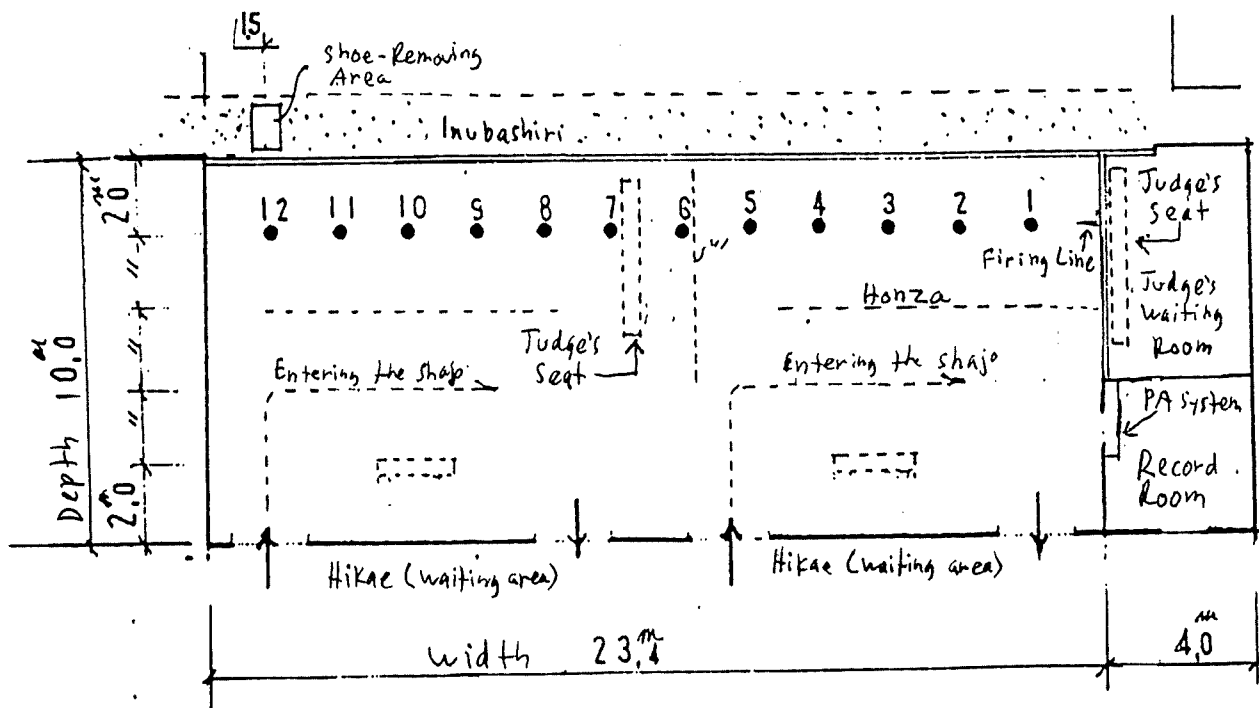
Sample Layout Of A 12 Person Shajo With 1.8 Meters Between Archers
